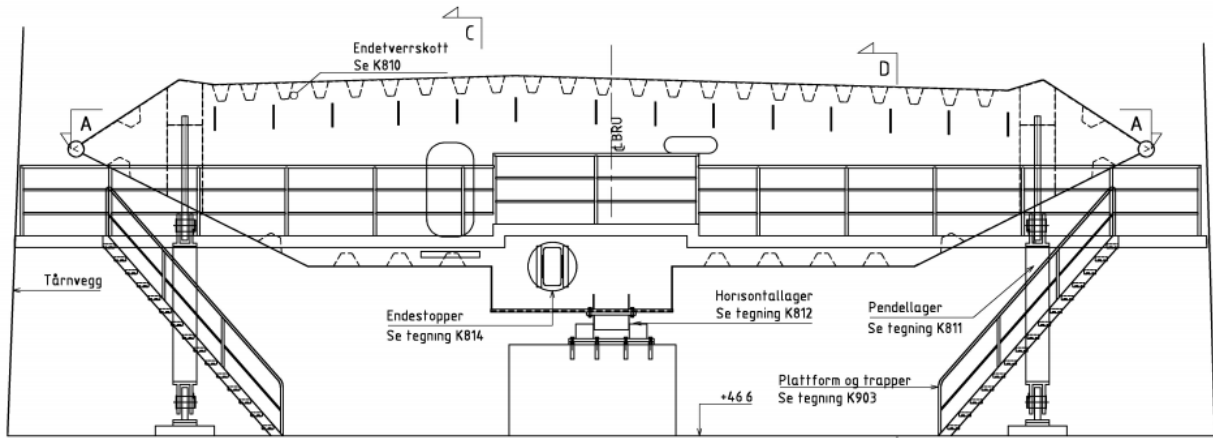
Connection between the stiffening girders and the transverse beam. Drawing: K807 [13]
